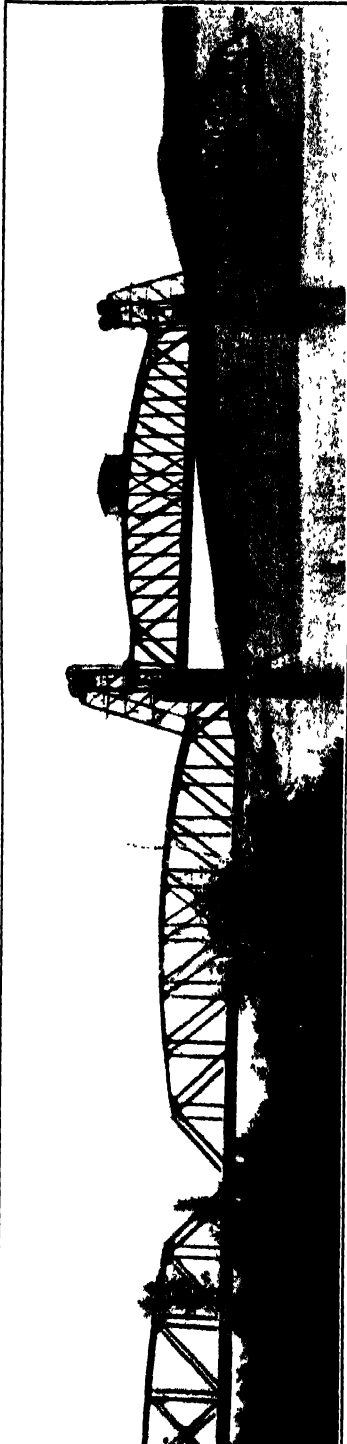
Great Northern Railway Bridge over the Yellowstone River, Montana.—Lifting Span Up.
